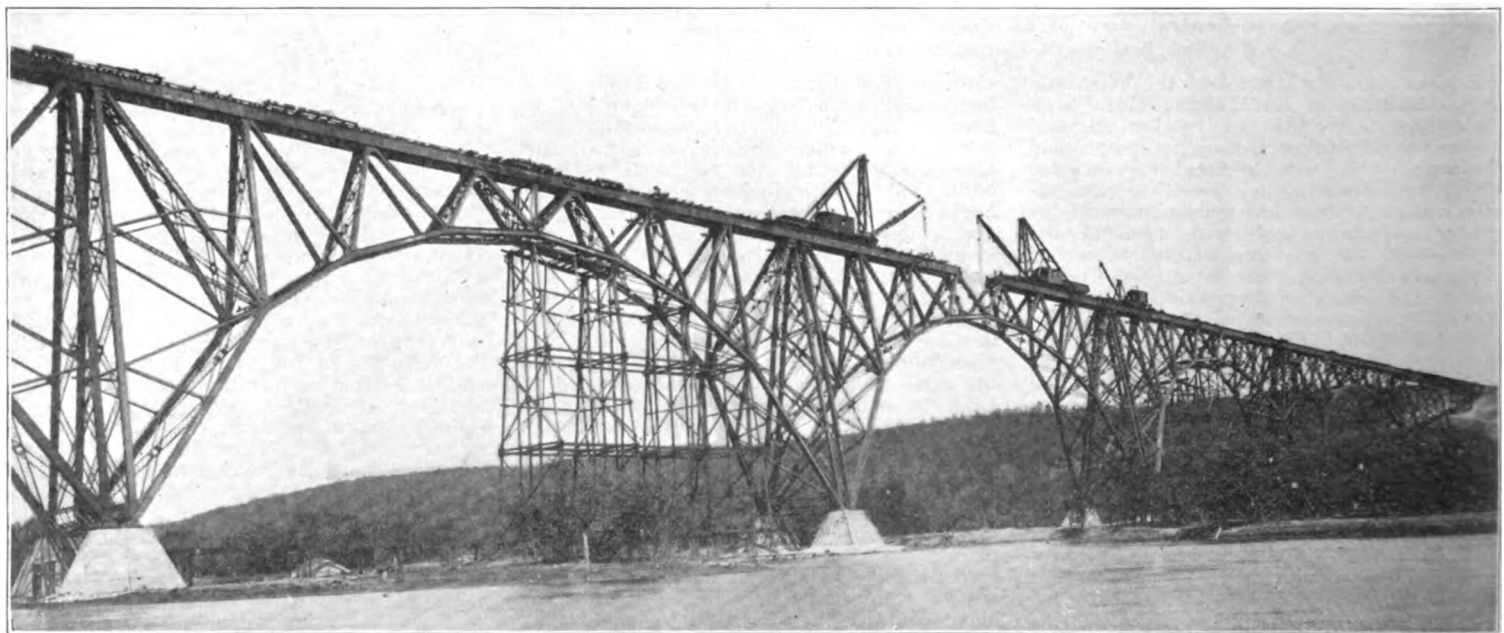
View Showing Derricks Erecting, St. Croix River Bridge.
